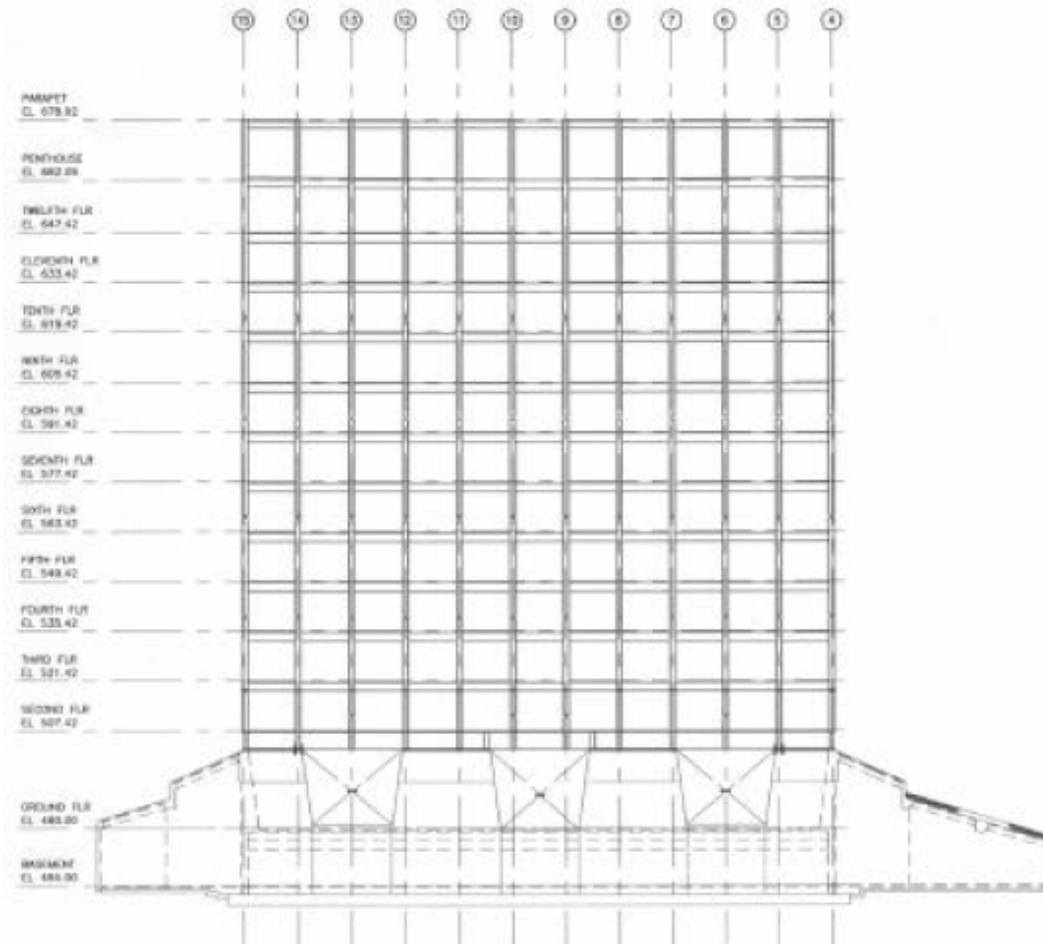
Elevation View at Perimeter of the DPW Building [Chen et al., 2001]
